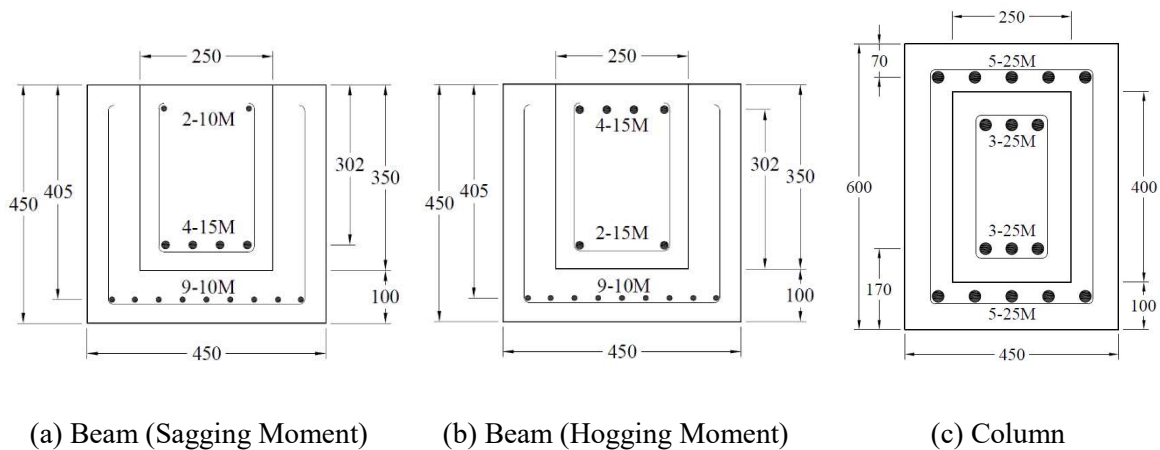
Cross-sectional views of the jacketed sections in the RC frame
